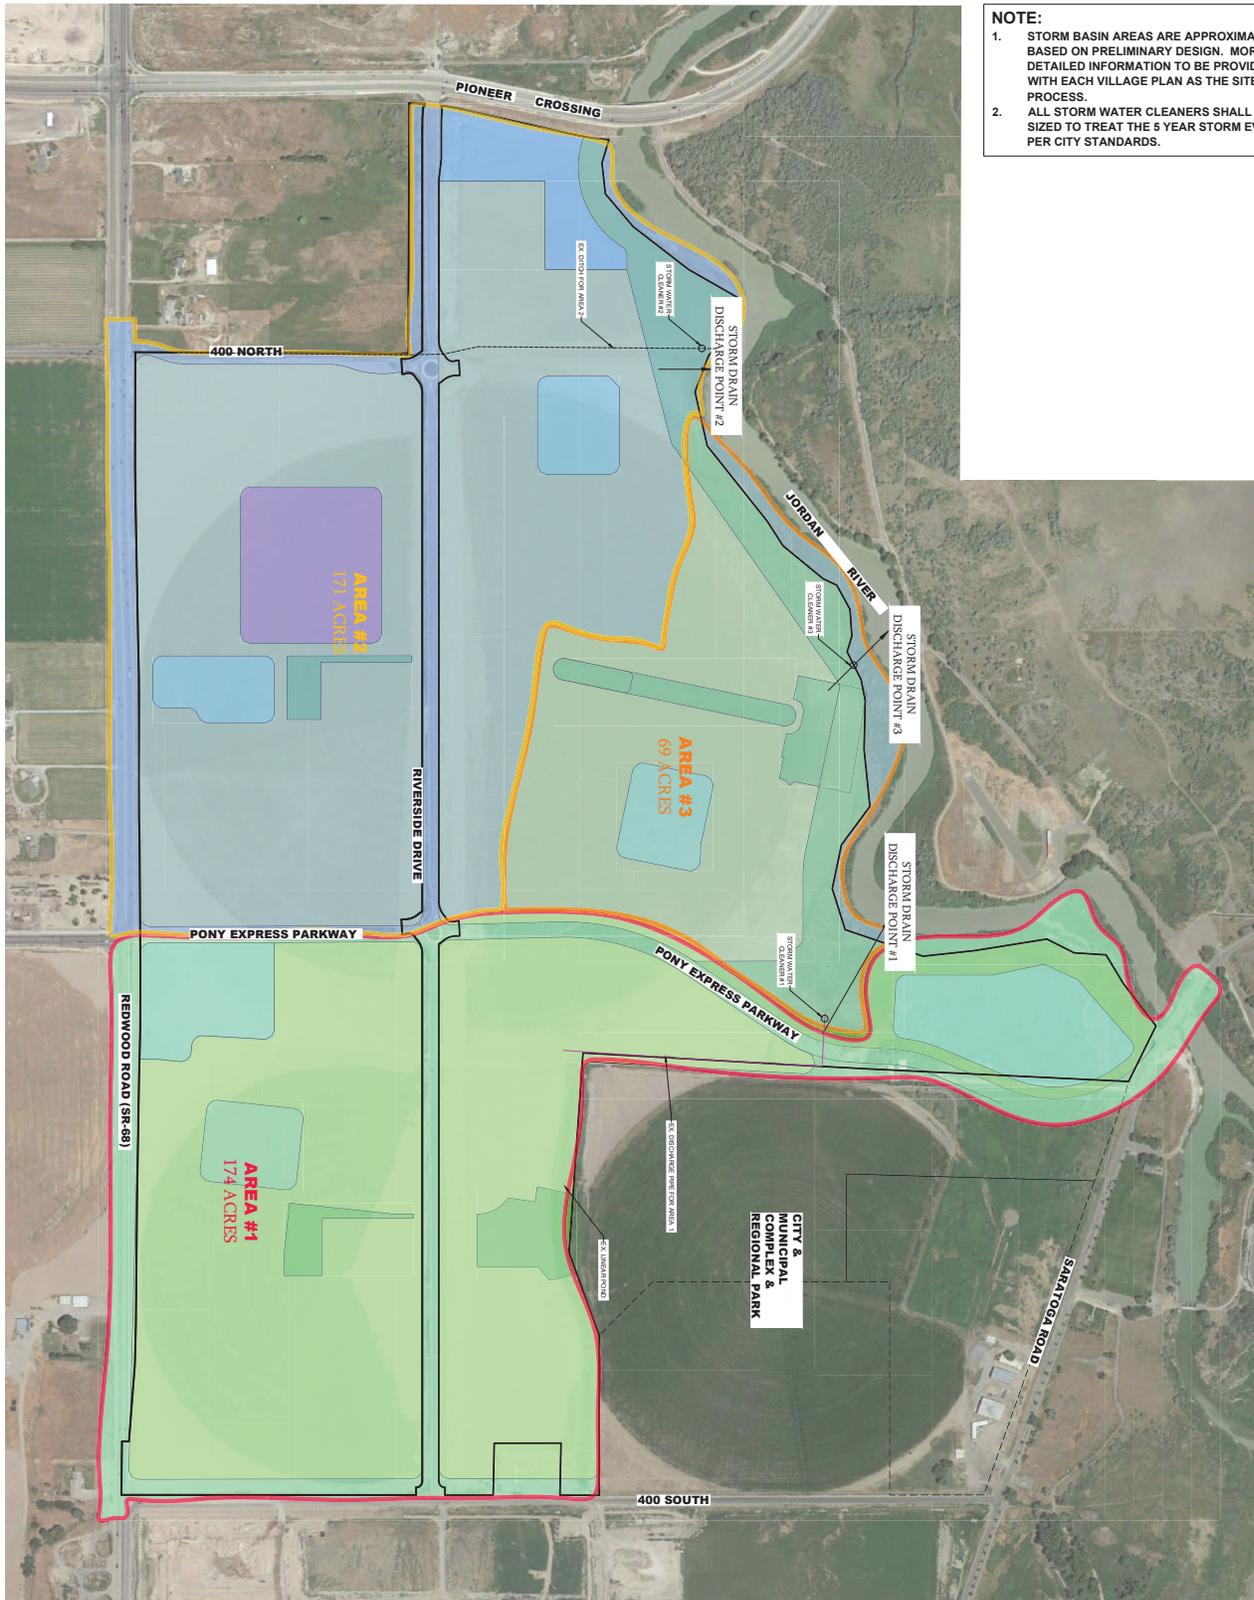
STORM DRAIN MASTER PLAN
